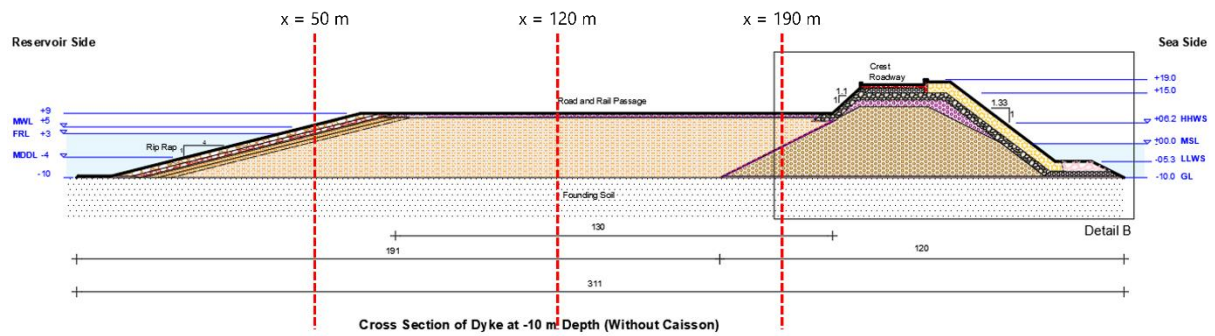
Cross-sections along the -10 m embankment section (without caisson)
